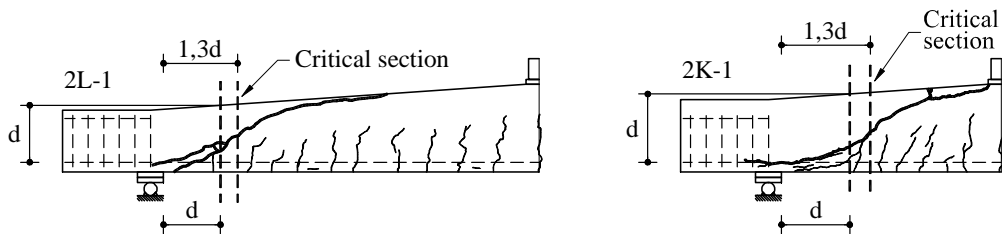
Assumed critical section and cracks of test beams 2L-1 and 2K-1
